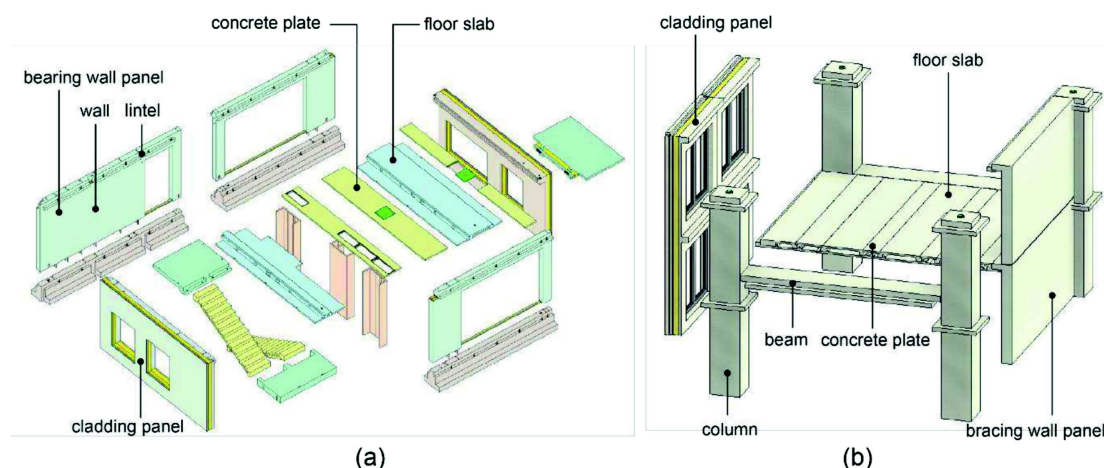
| Generic components of the precast systems under study: (a) wall and (b) coupled wall-frame.
